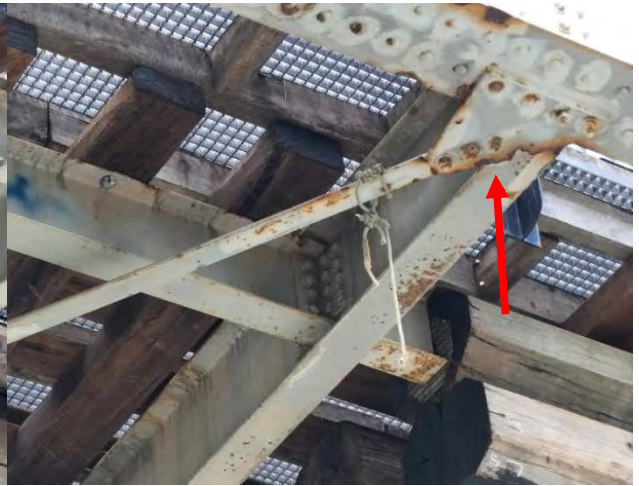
Span 6 cross bracing cleats corrosion at main girder connections
